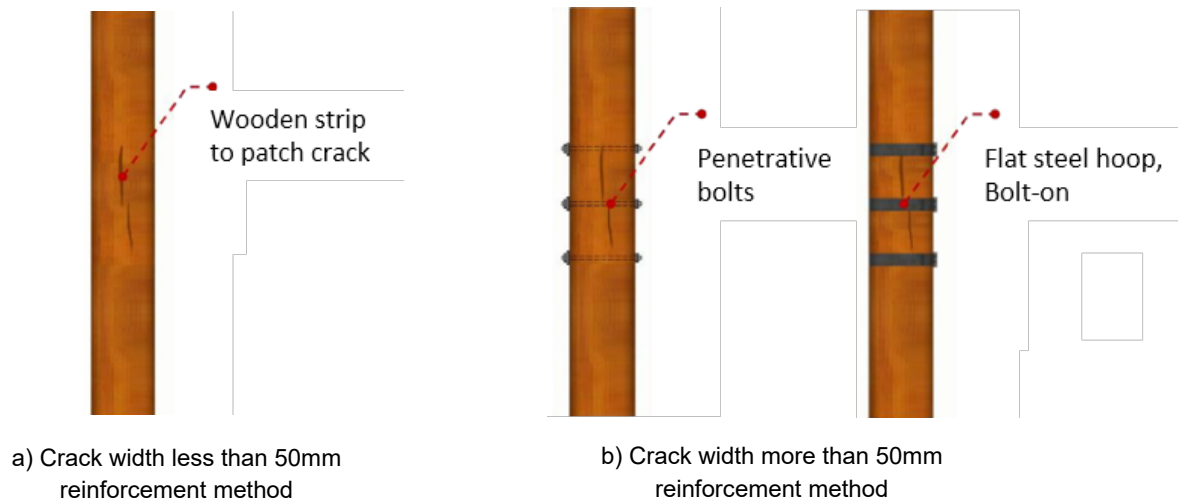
Example of wooden pillar structure reinforcement (source: reference [73])
